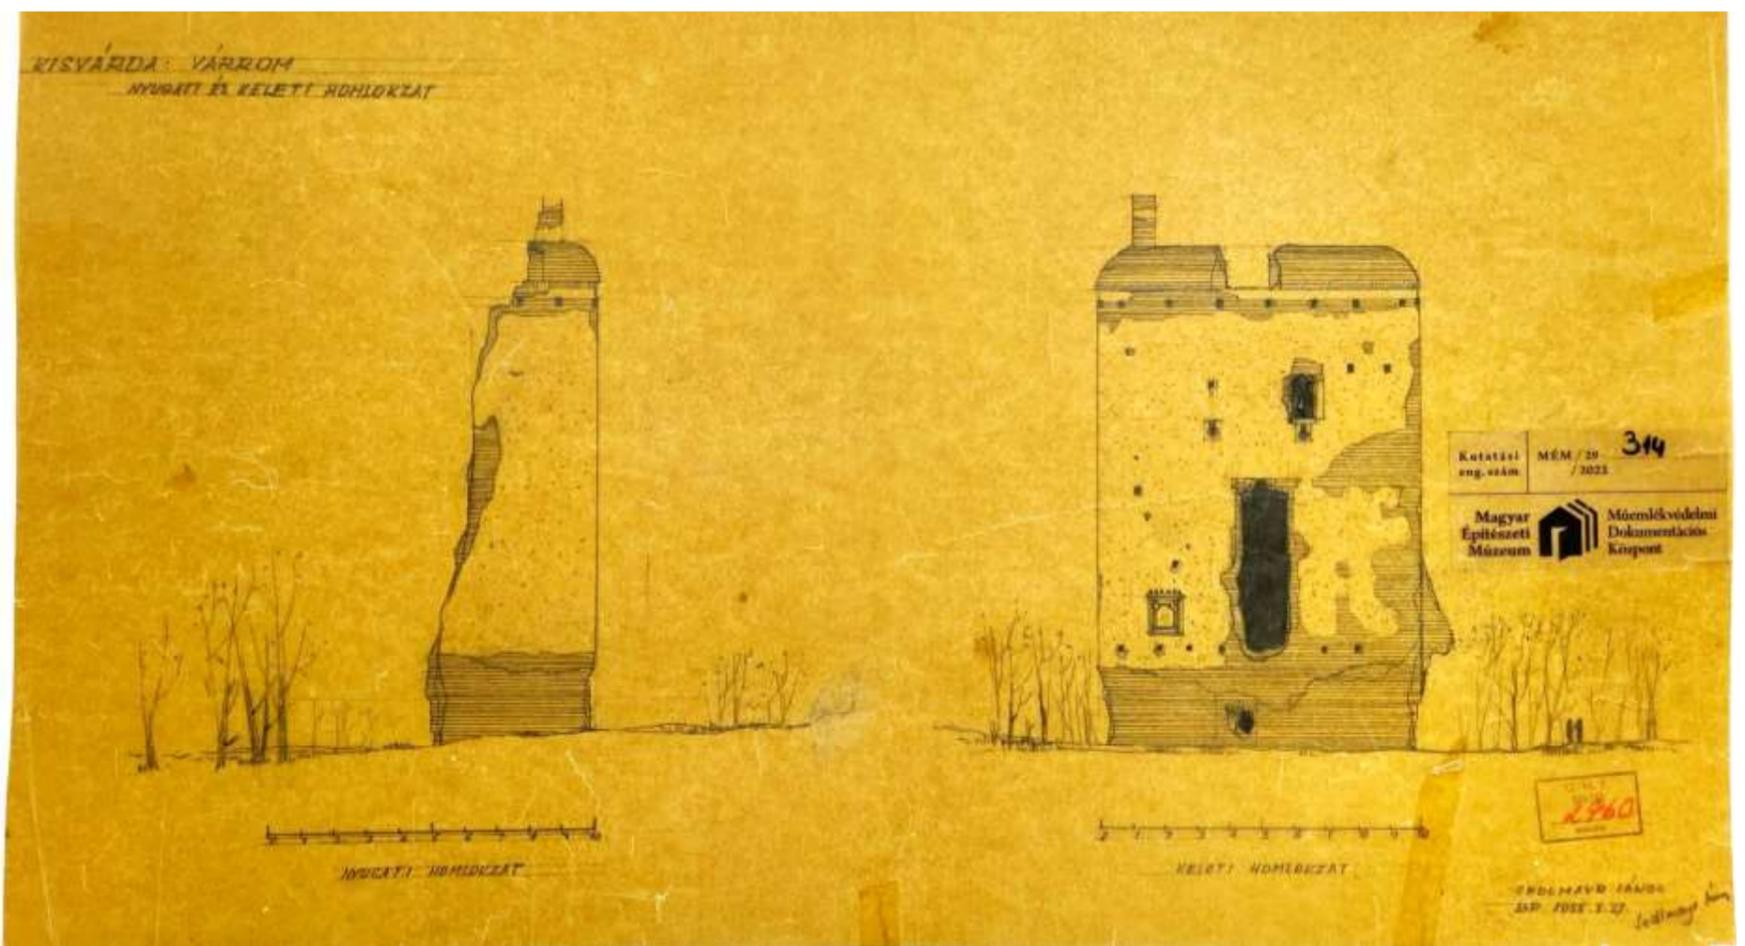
János Sedlmayr's survey, western (left), eastern (right) façade. (MÉM MDK Architecture Plan Collection, 2960. sheet.)
